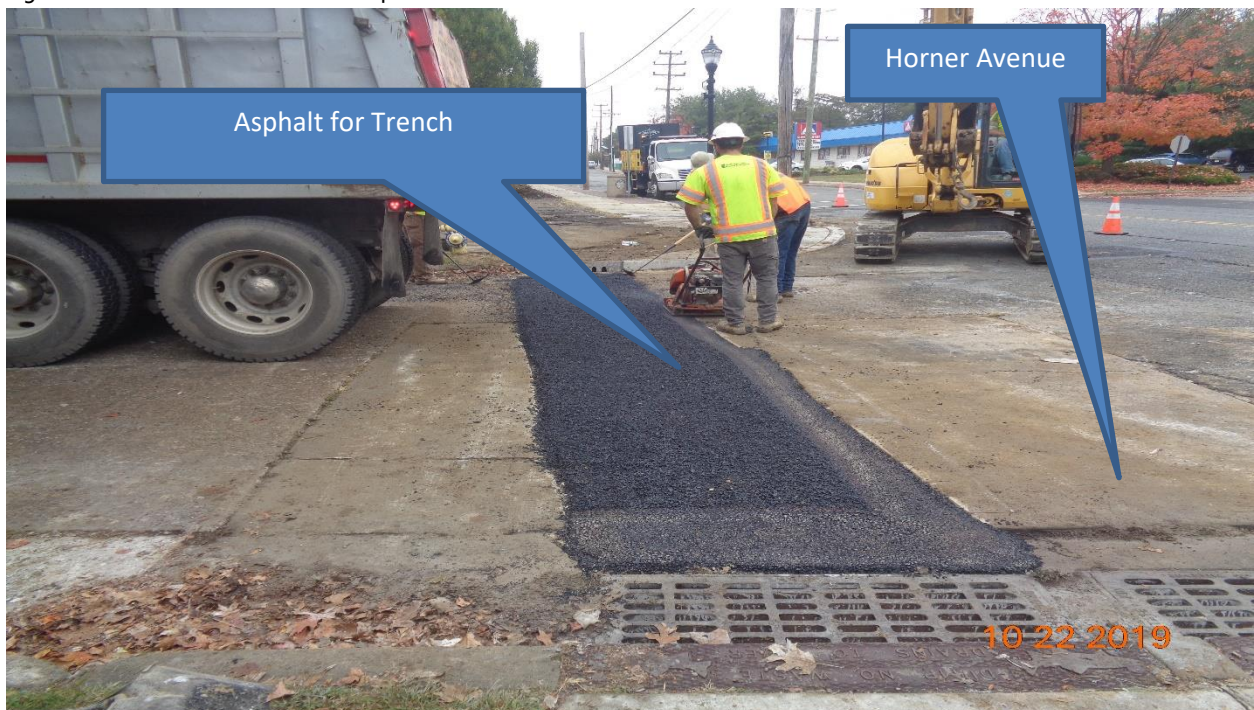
15" Reinforced Concrete Pipe, Class IV was installed across Horner Avenue, LT.
